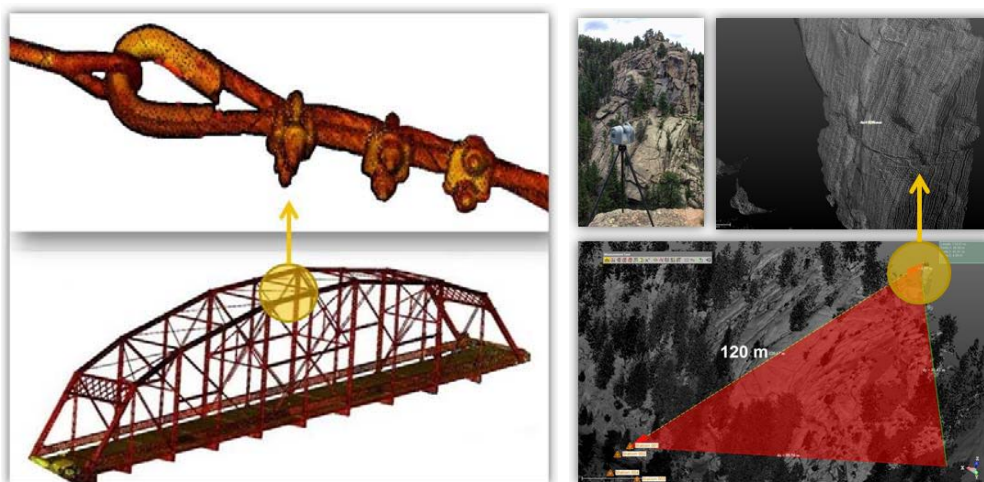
Bridge overview and detail. Rock face photo overview and detail
